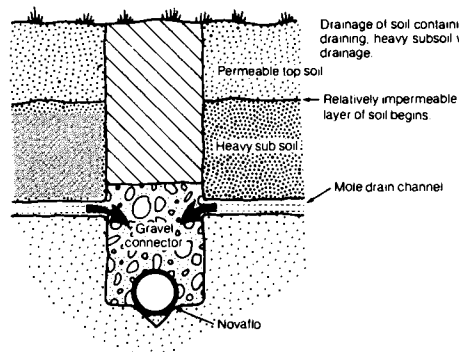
(a) Drainage of soil containing a slow draining, heavy subsoil with mole drainage.
